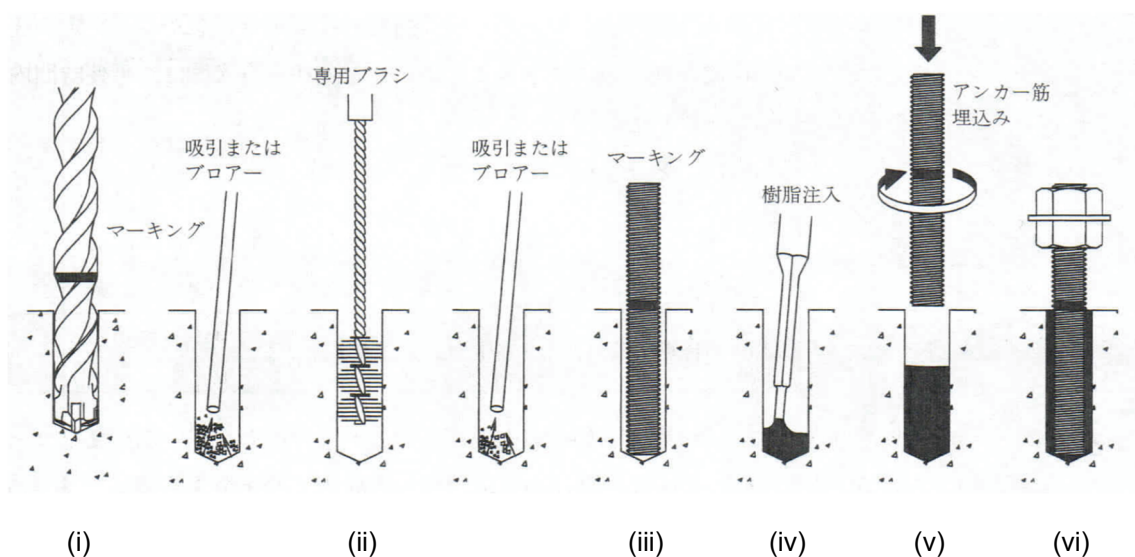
Installation procedure of post-installed adhesive anchor
